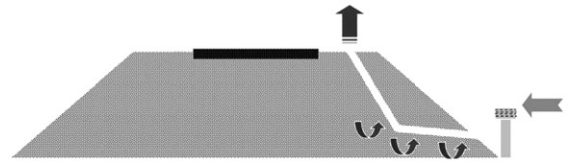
Heat drain placed in the shoulder of a road embankment (Beaulac, 2006).
